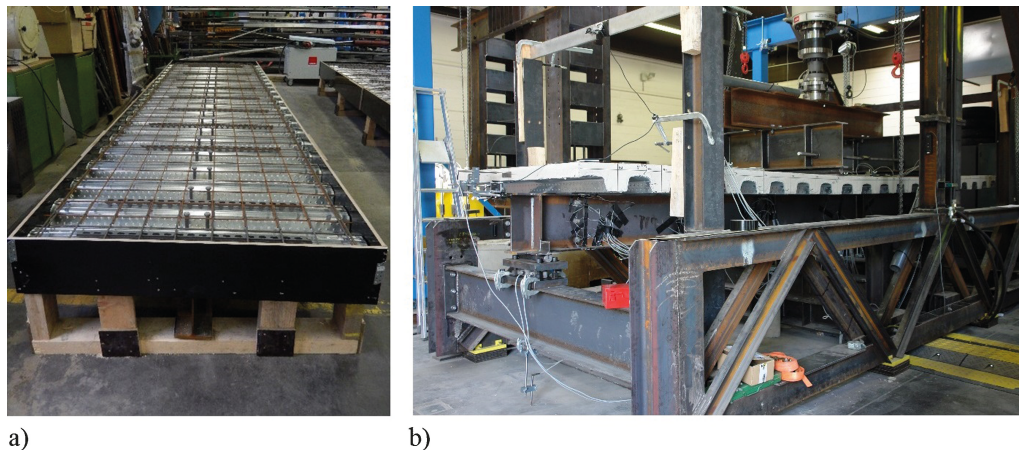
Beam 2-10: a) specimen before concreting; b) specimen in the testing frame
